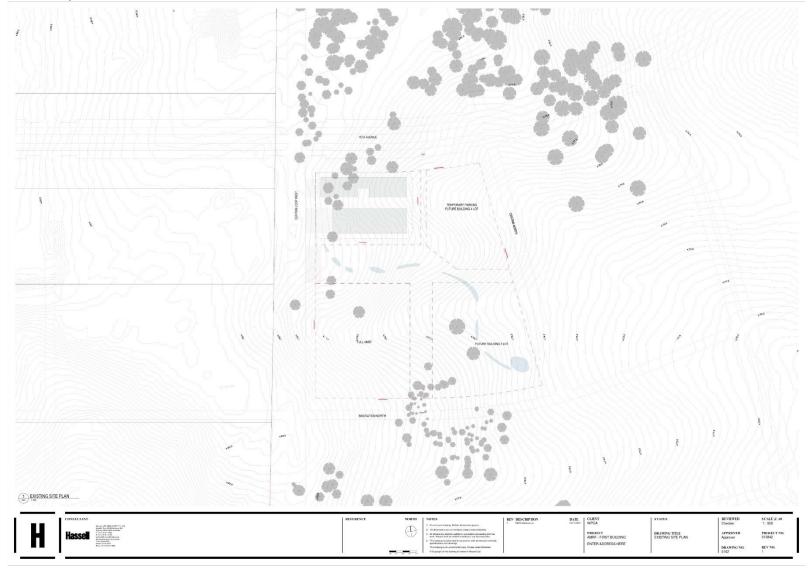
AMRF – existing site plan (Architectural drawings prepared by Hassell, 2021).
